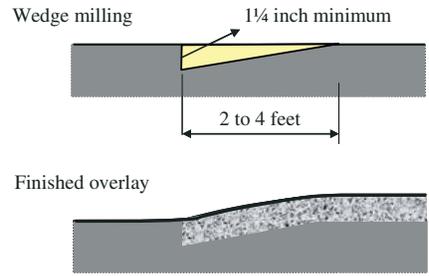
Wedge milling to key-in a 2-in.-thick AC patch.
